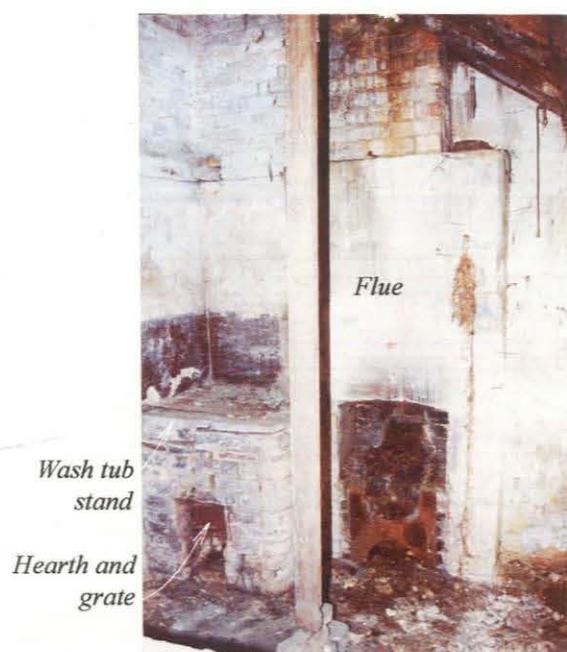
Outbuilding room 64/5, looking southwest; featuring a fireplace and flue built into the west wall, together with a brick-built, iron wash tub stand with a hearth and grate.
